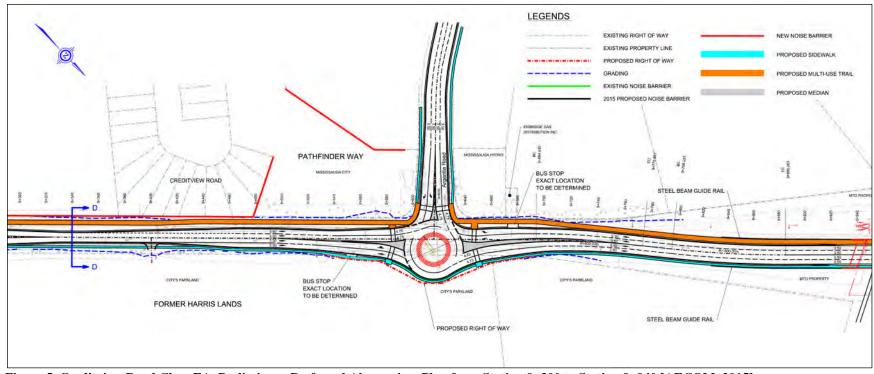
Creditview Road Class EA, Preliminary Preferred Alternative: Plan from Station 9+300 to Station 9+940 [AECOM, 2015].
